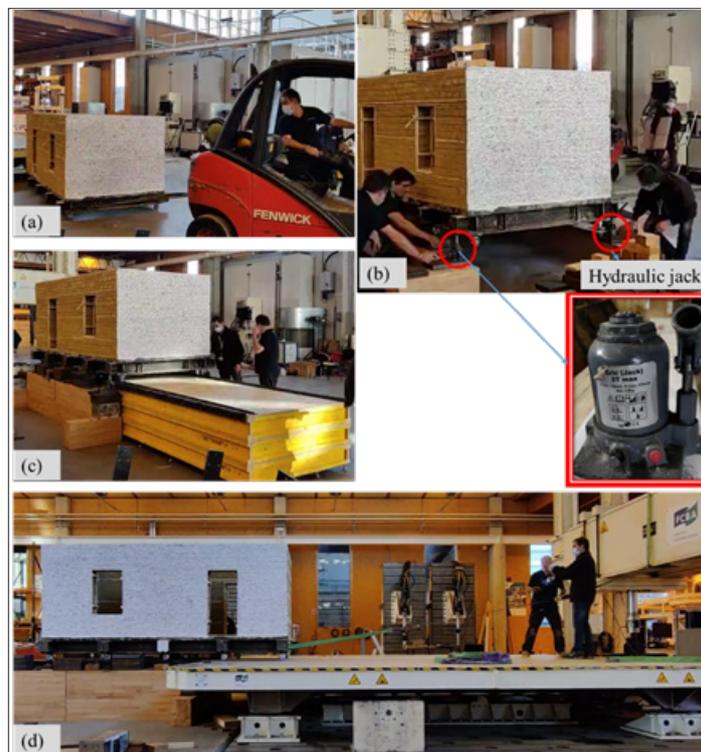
Moving building on the floor (a), elevating the building using car hydraulic jack and timber blocks (b), placement of wooden platform (c) and moving building on the shake table (d)
